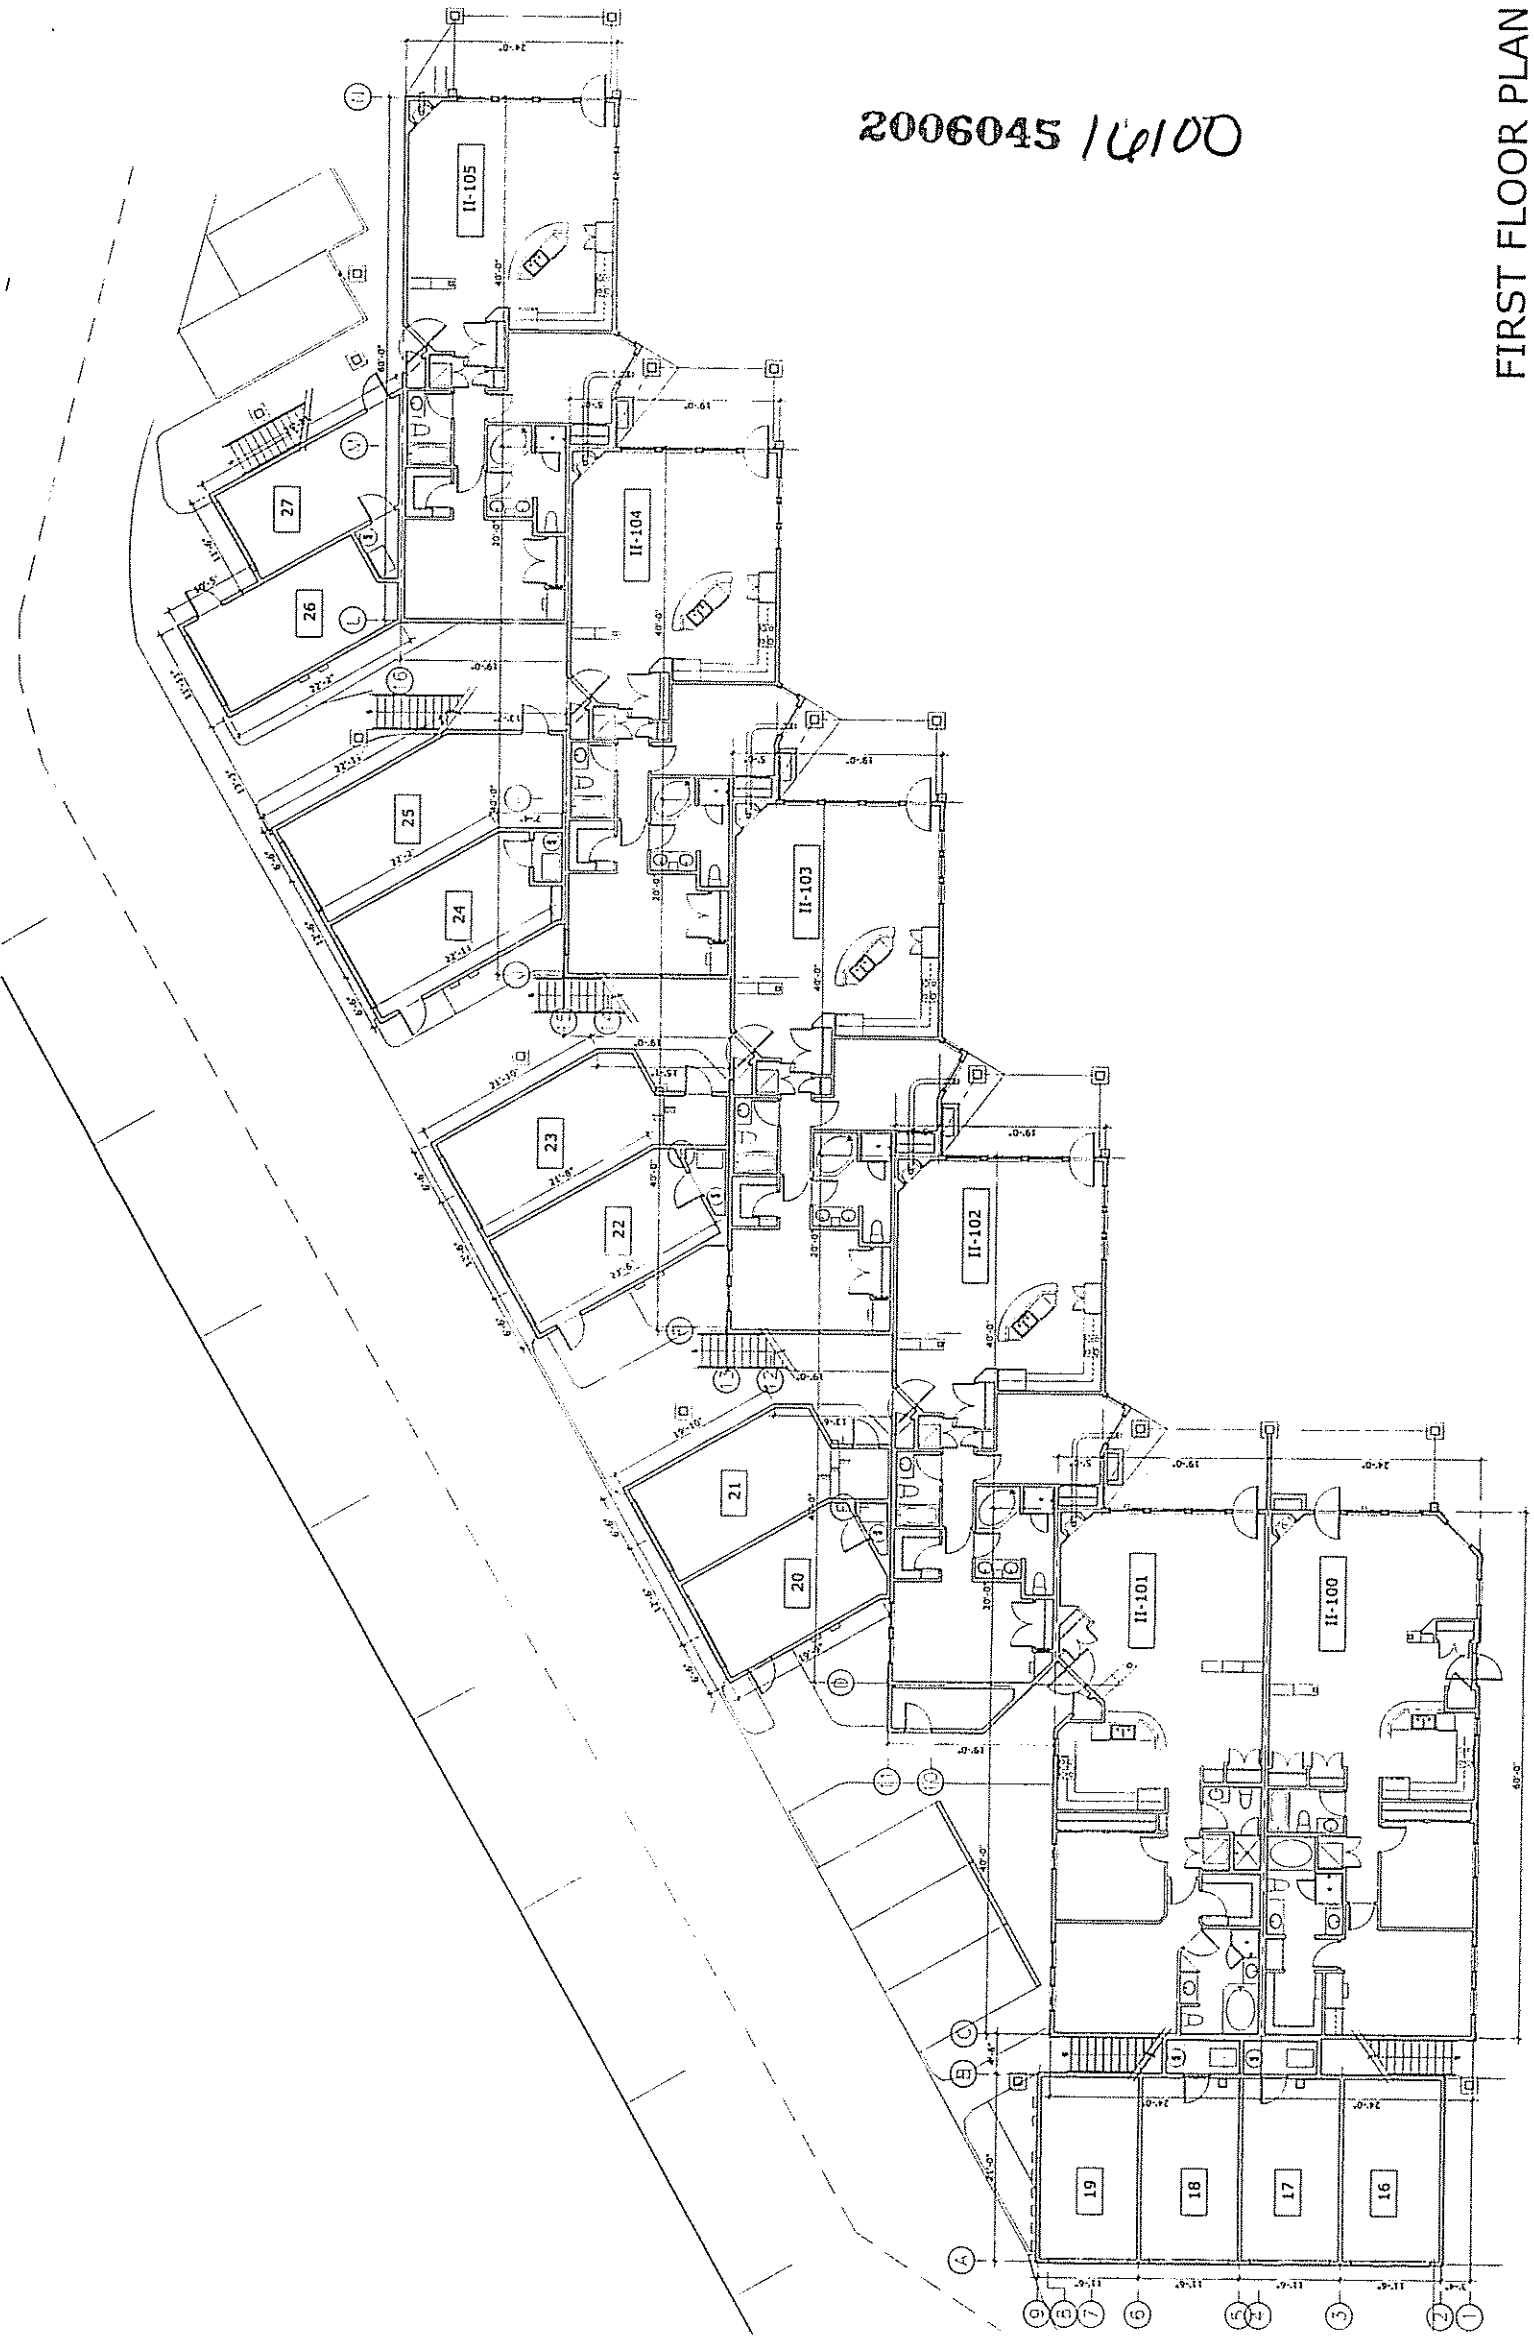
Building II First floor plan depicting Units II-100 thru II-105
